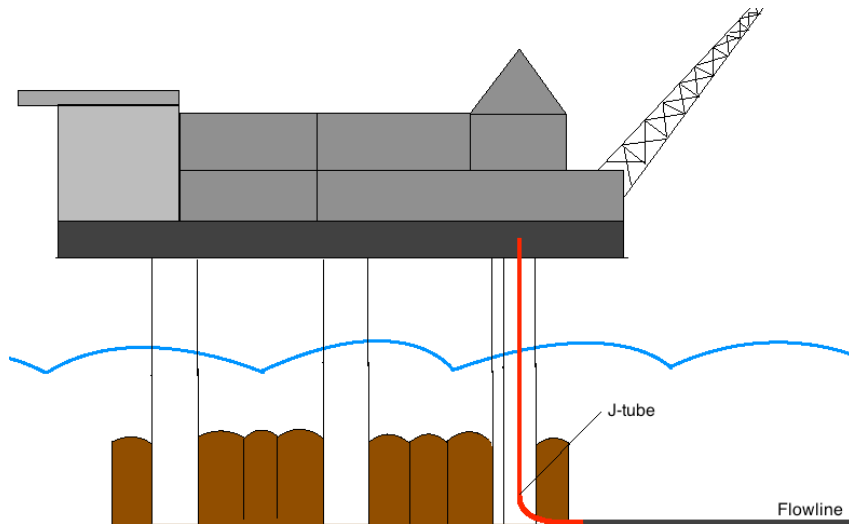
J-tubes are used on fixed platforms for tie-ins
